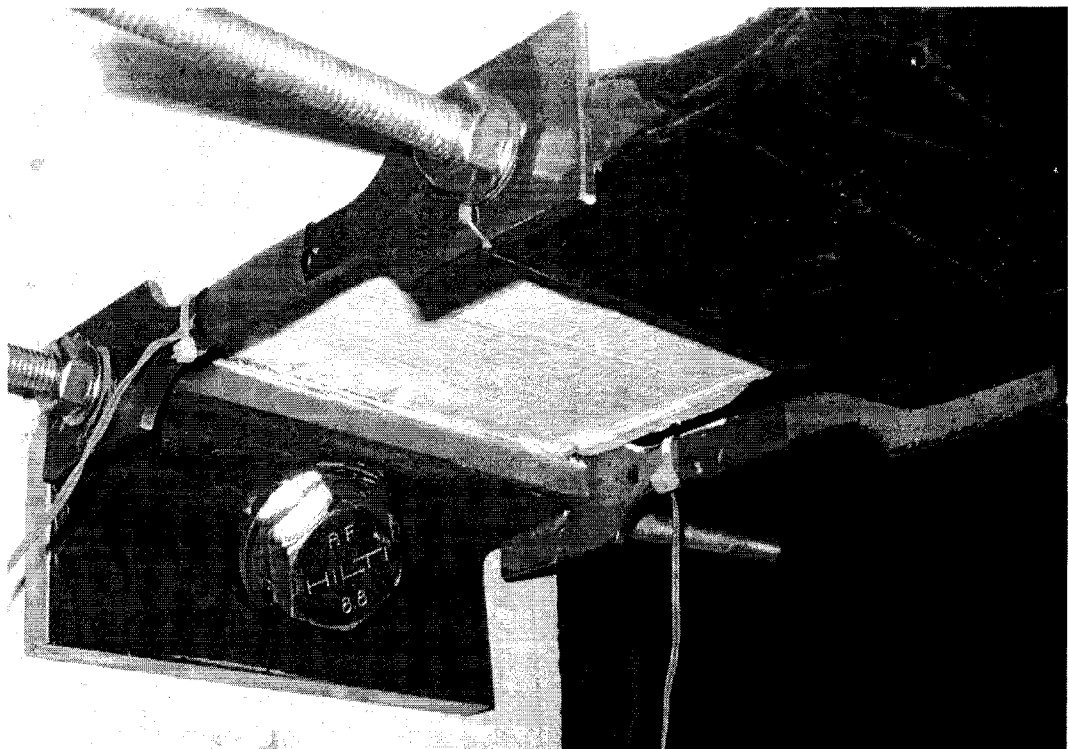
Ductile anchor system used in strengthening beams F-M-U and F-M-B
